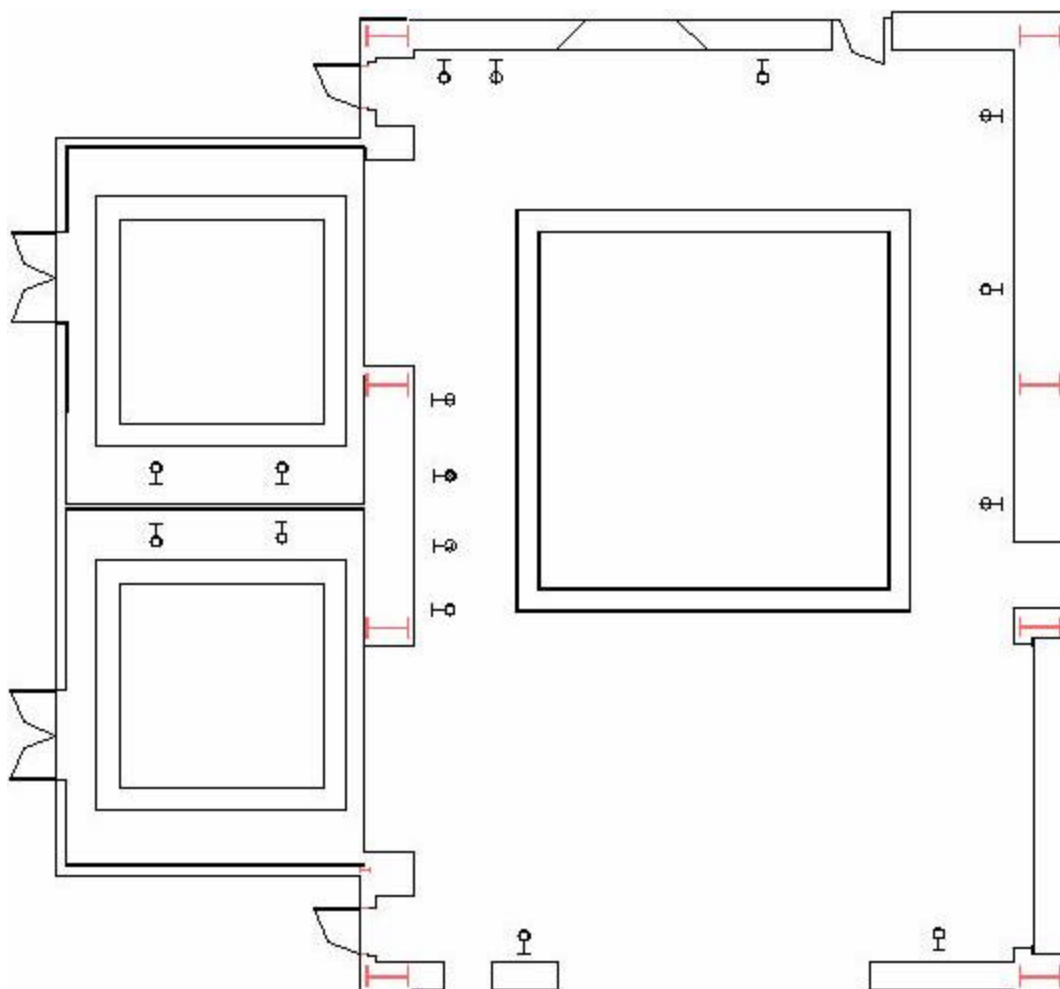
High Bay (West) in Building 1032 – Layout
